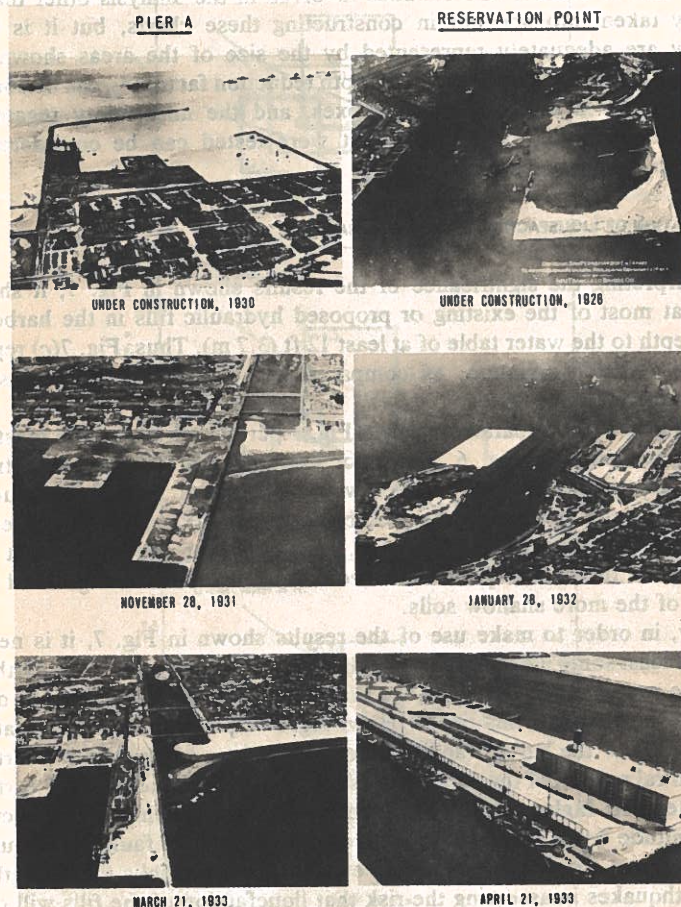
Photographs of Pre-1933 Hydraulic Fills
